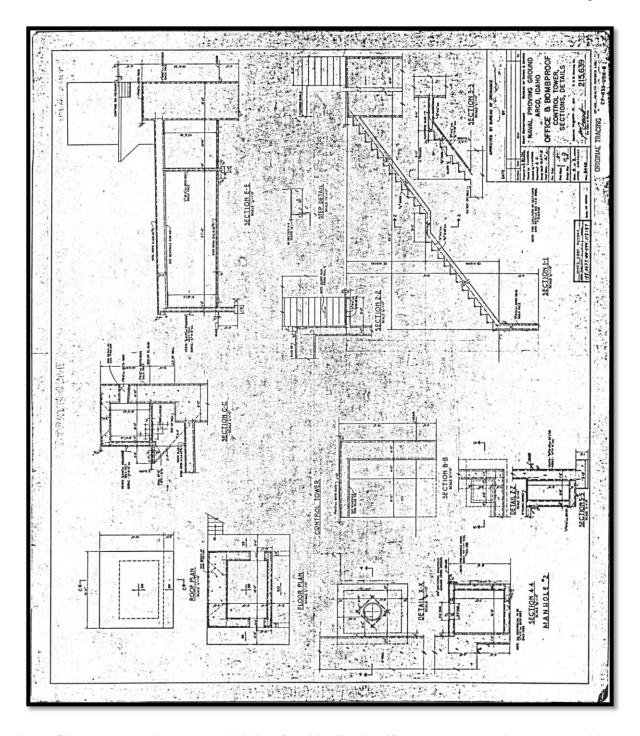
INL Drawing number 112187 (CF-633-USN-6); office and bombproof storage (addition on southwest elevation of concussion wall / CFA-633 - extant), control tower, sections and details; sheet 5 of 7; ca. 1943.
